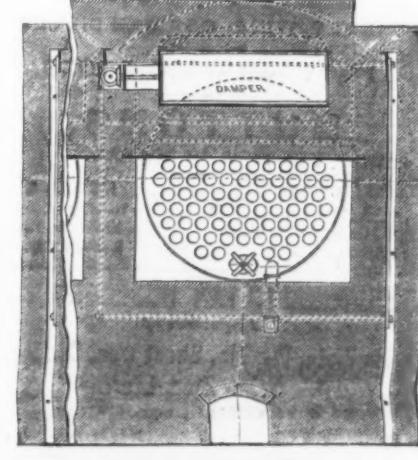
Cross Section through the Back Connections, showing Damper, Rear End of Boiler and Air Spaces in the Brickwork.
